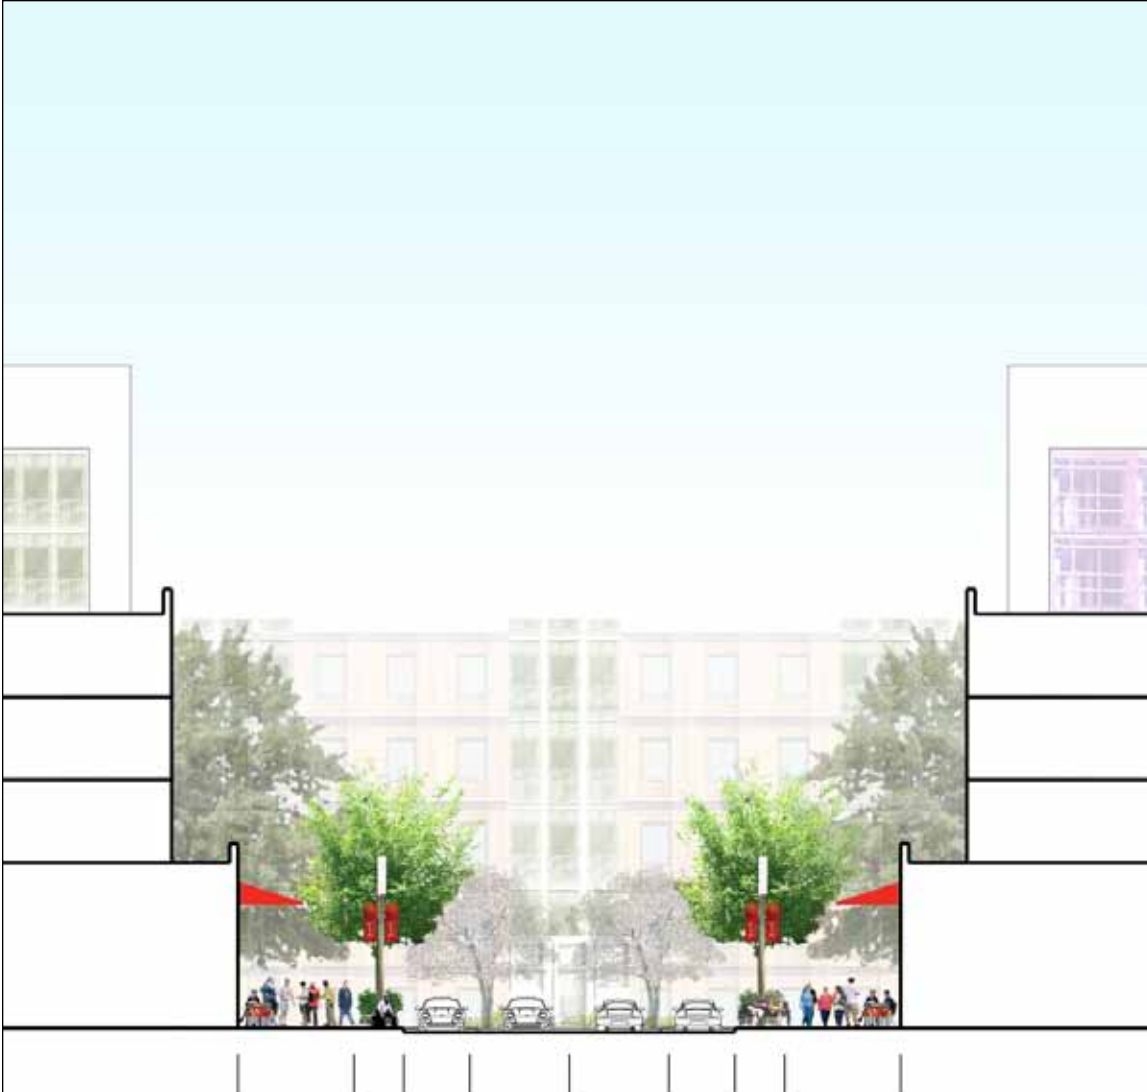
Pickett Place Main Street provides one moving lane for traffic and bicycles in each direction, parallel parking and broad sidewalks for retail stores.
